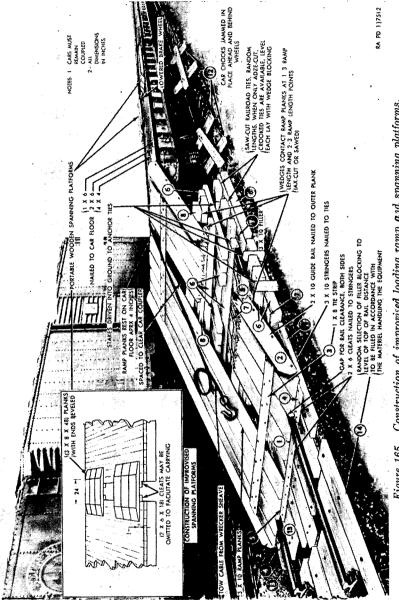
Construction of improviced loading ramp a ud spanning platforms.
